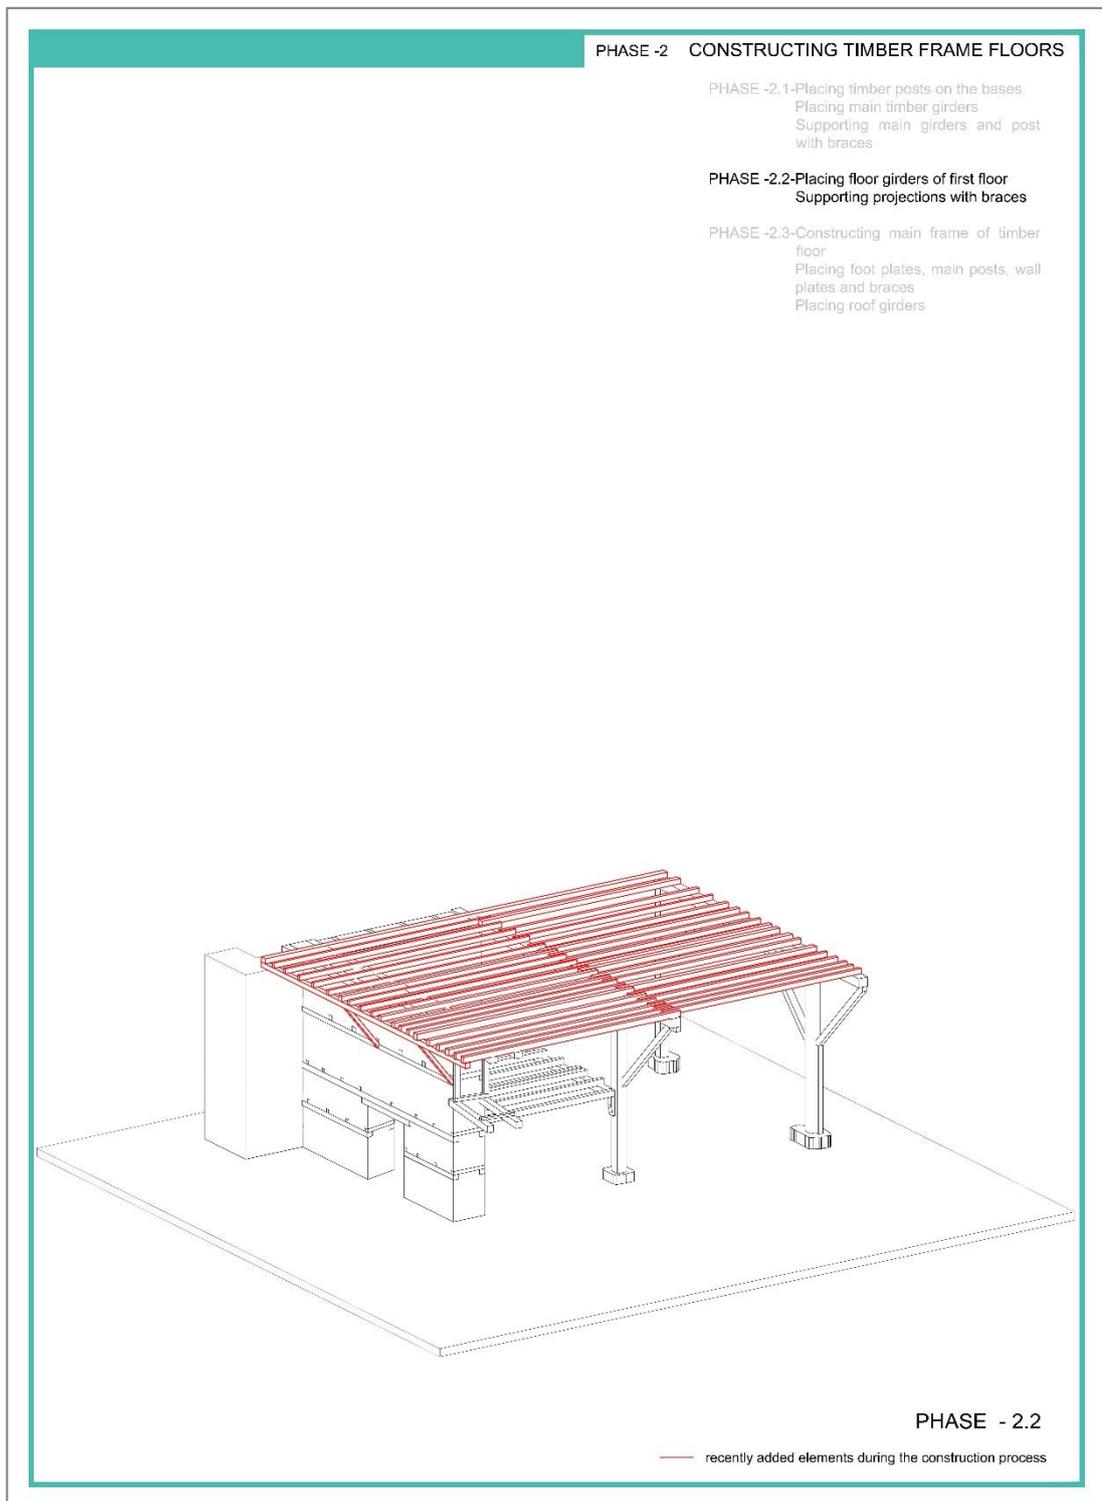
Phase 2.2.- Constructing timber frame floors
